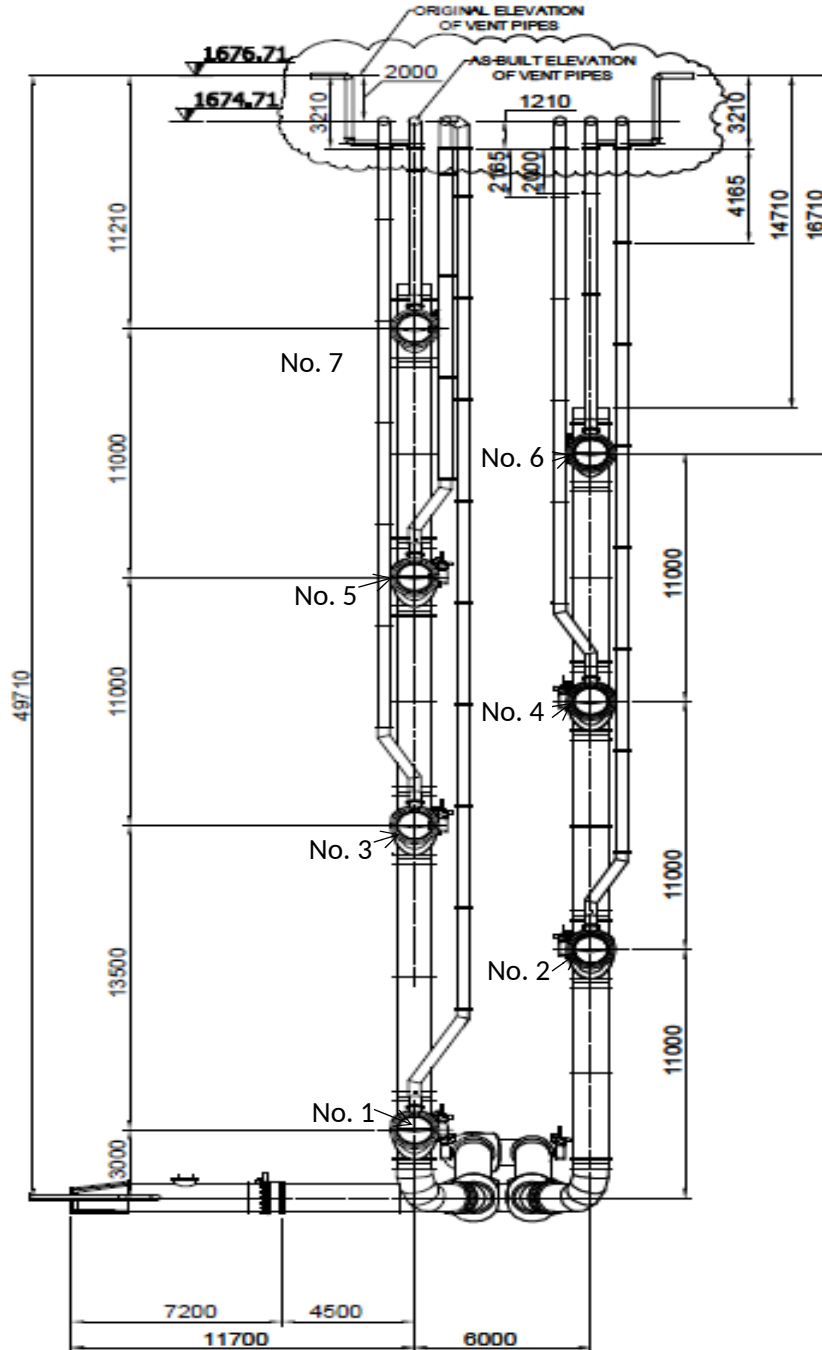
Side view of Metolong Dam intake tower, facing South-West (Source: Metolong dam safety department).
